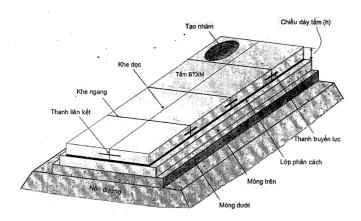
Cement concrete pavement slab [decree no. 3230/QD-BGTVT; http://www.sgtvt.danang.gov.vn/images/stories/3230 QD BGTVT.pdf]
